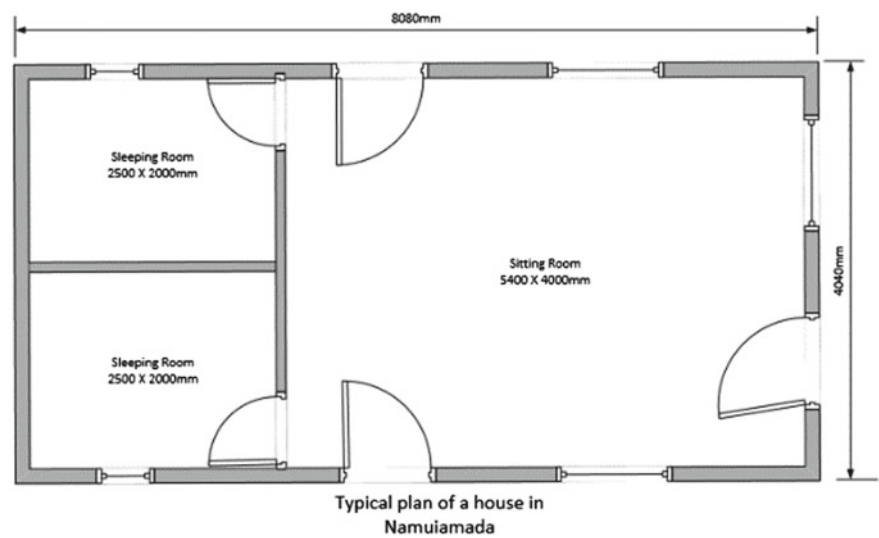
Plan for a typical house in Namuiamada. *Source* ElkhARBoutly [13]
